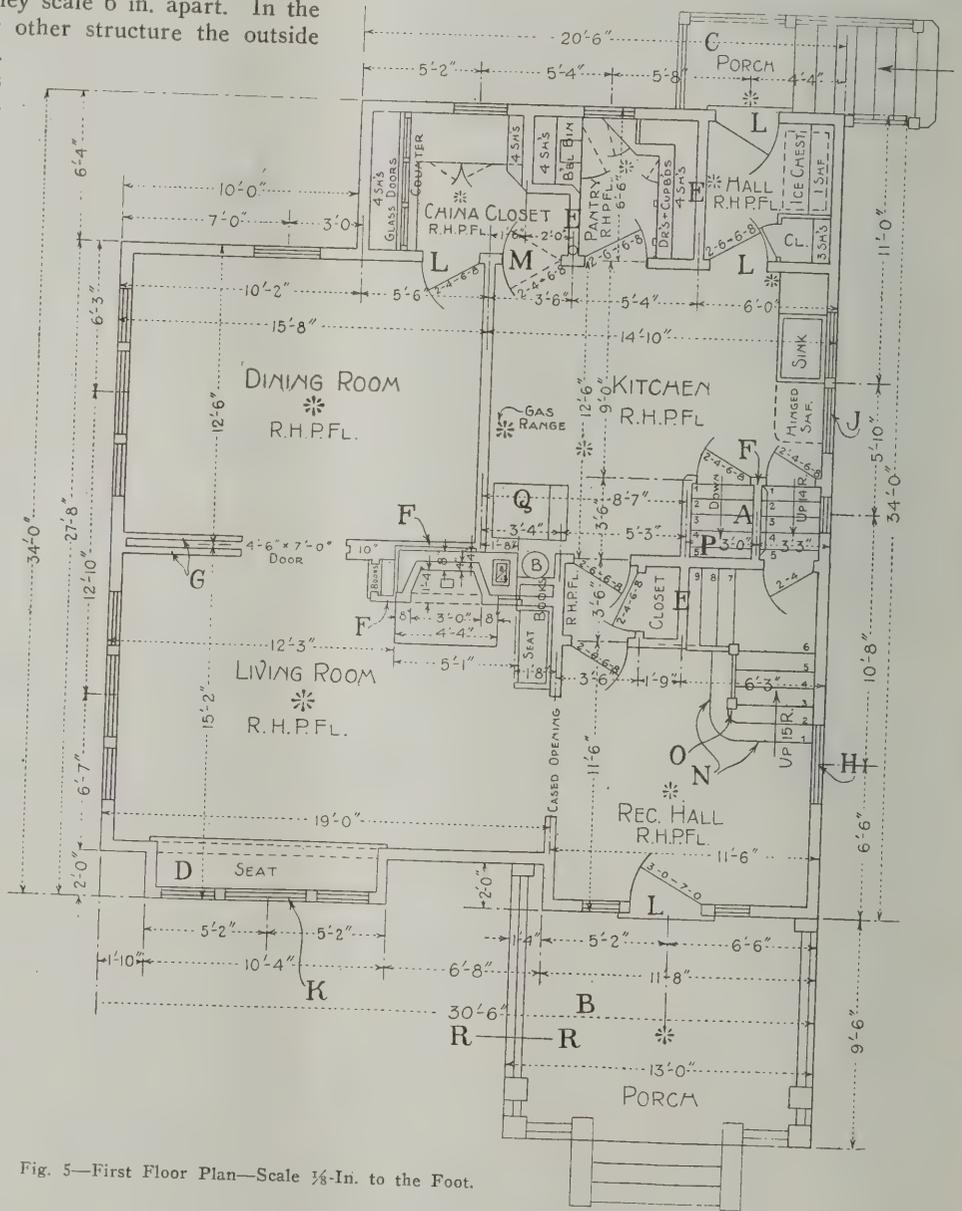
First Floor Plan—Scale $\frac{1}{8}$ -In. to the Foot.
